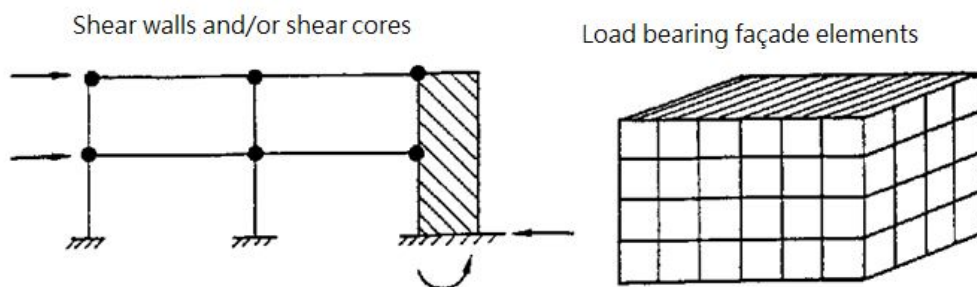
Stability systems (left) shear walls and/or shear cores (right) load bearing façade elements
